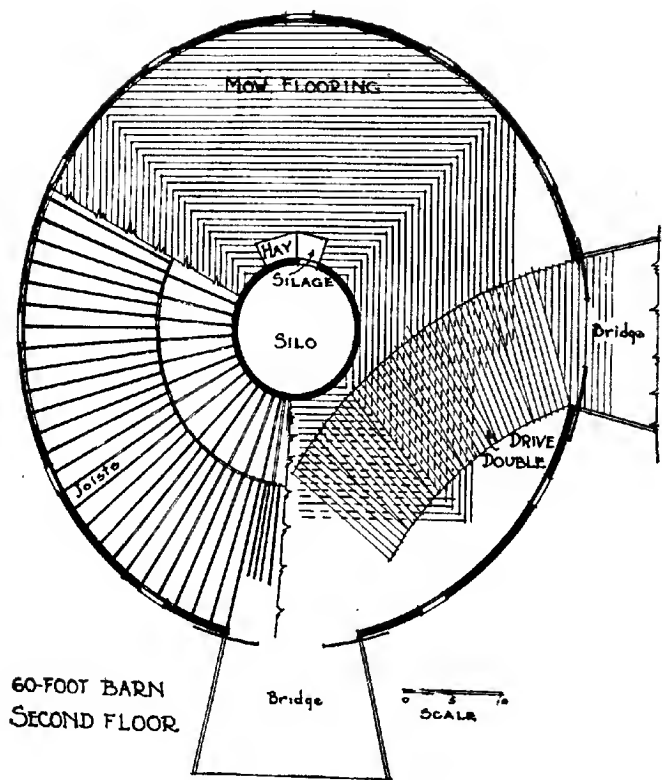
RADIAL ARRANGEMENT OF SECOND-FLOOR JOISTS
